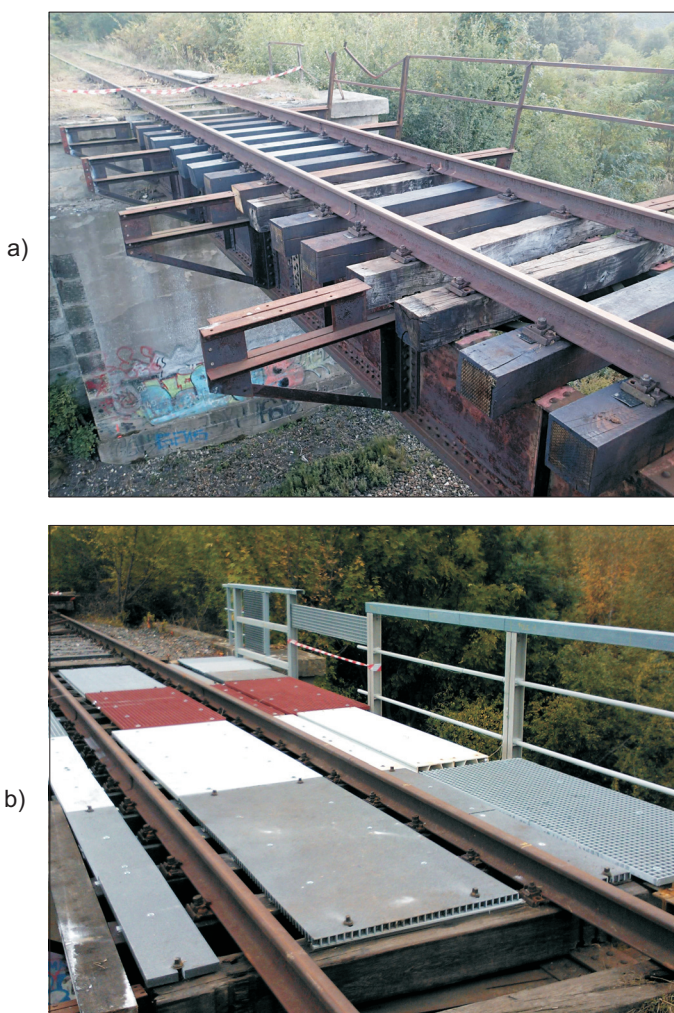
The view of the tested bridge: a) before FRP application, b) after the FRP members were mounted on the bridge
